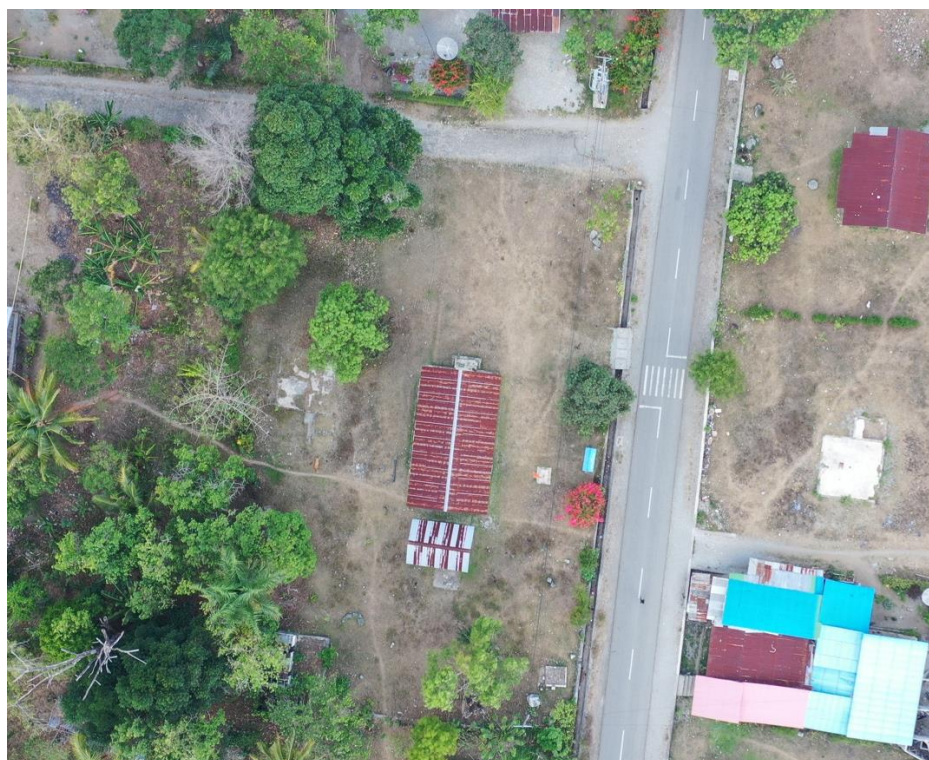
Location of the proposed Public Toilet in Suco Letefoho Center
